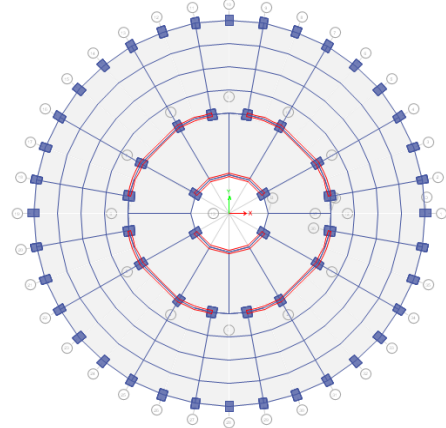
Plan of circular Framed Tubes Structure with Secondary Beam
